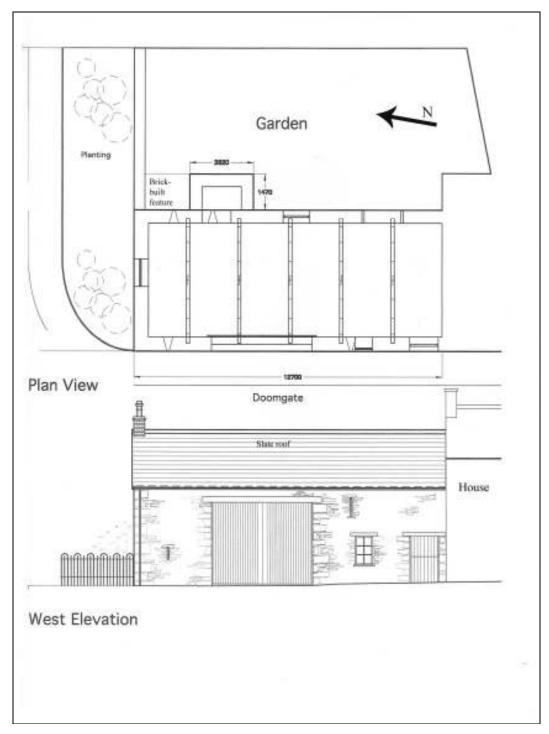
Ground plan and west elevation (Scale 1:100) (Drawings courtesy of Foskett Hylton)
